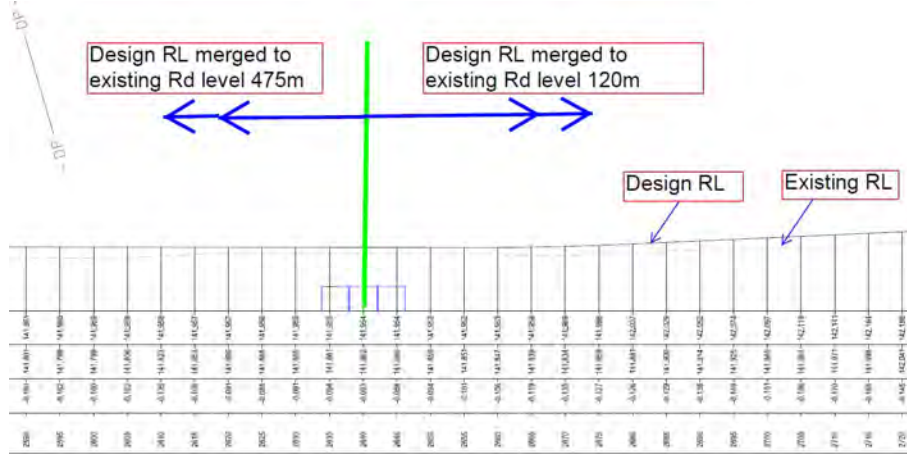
Option 2 – Removing the concrete stiffening and matching the existing culvert obvert
